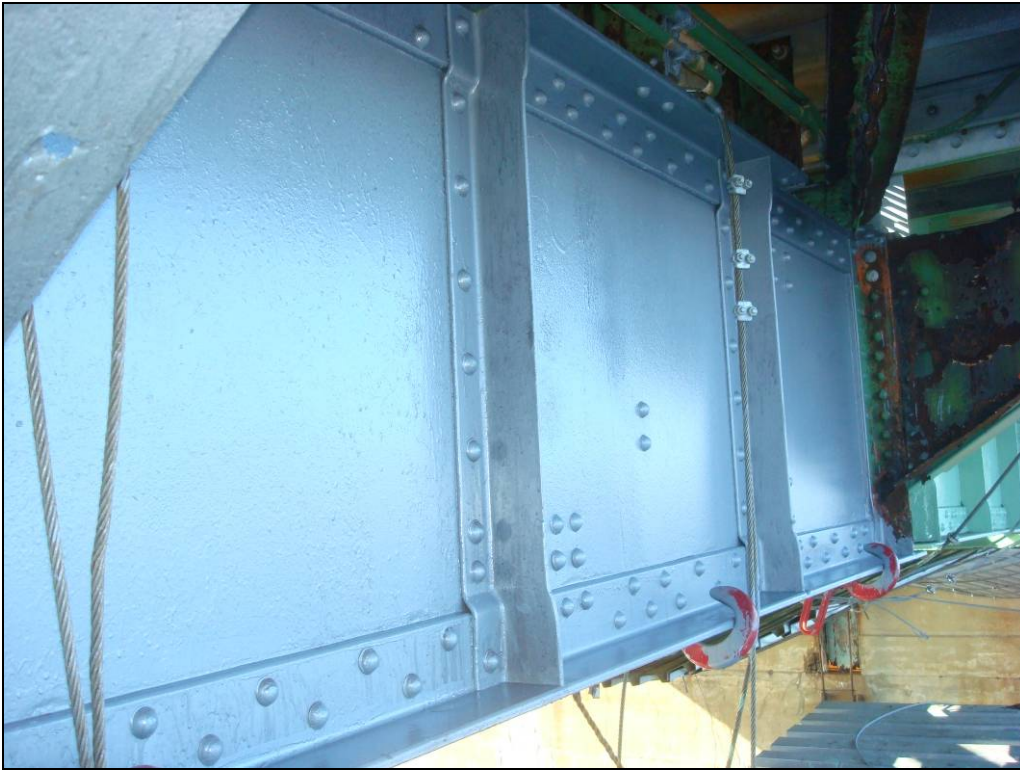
The Southeast girder elevation between the FB1 and FB2 primed with Epoxy Mastic Aluminum.
